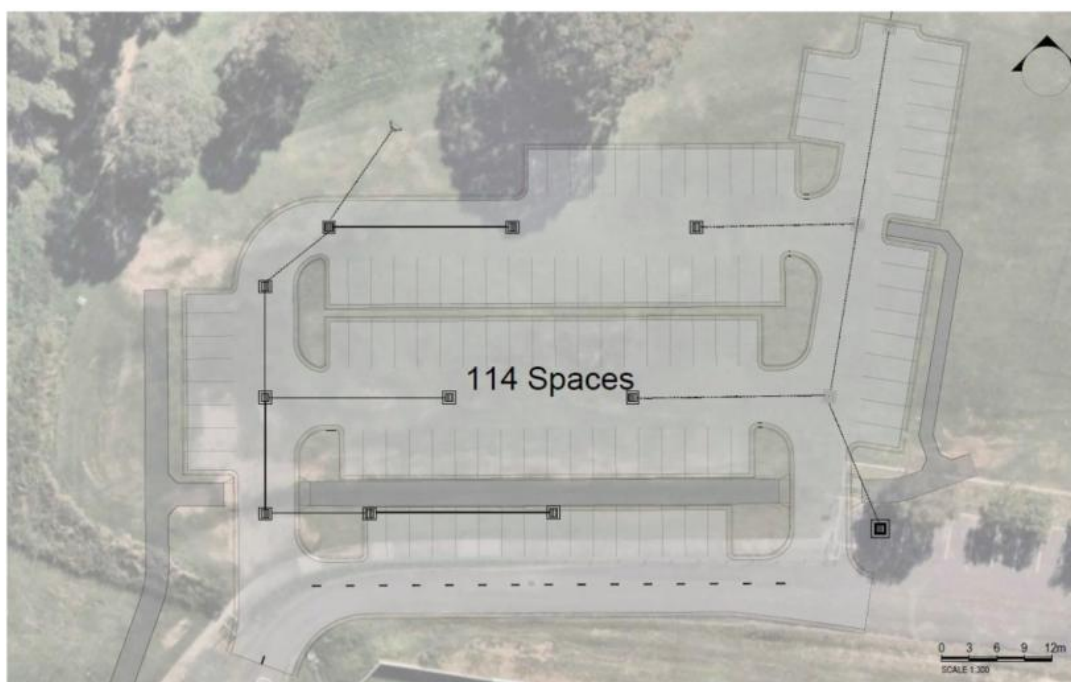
Indicative Carpark Layout (subject to separate approval)
